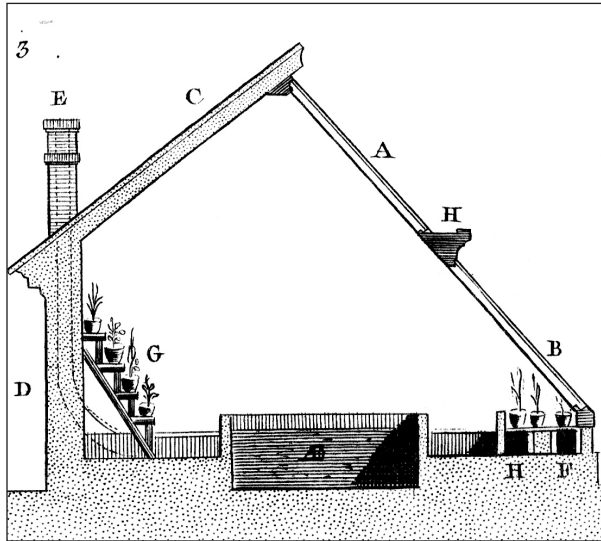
Profile of a lean-to style greenhouse from Diderot's late 18th-century *Encyclopédie*. This greenhouse has plants on shelves at the front and back of the structure, as well as a central bark pit.
